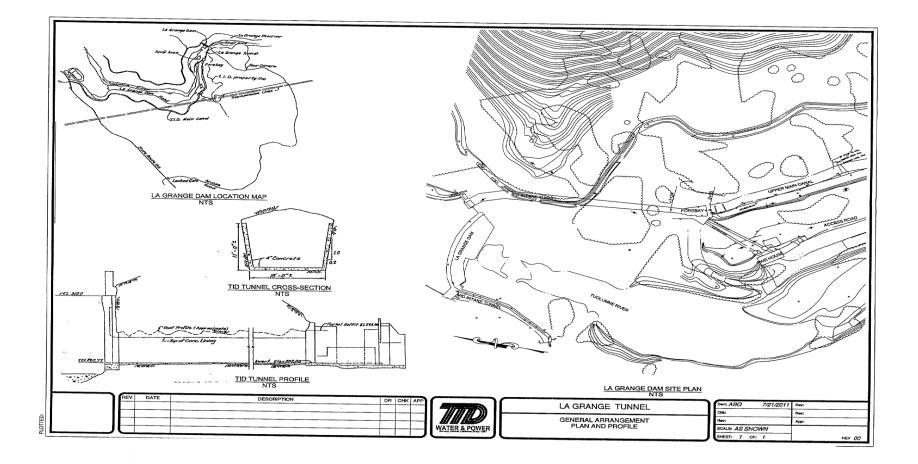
Site plan of La Grange diversion dam and facilities showing diversion dam, TID tunnel intake, tunnel location, penstocks, powerhouse, and TID's Upper Main Canal.
